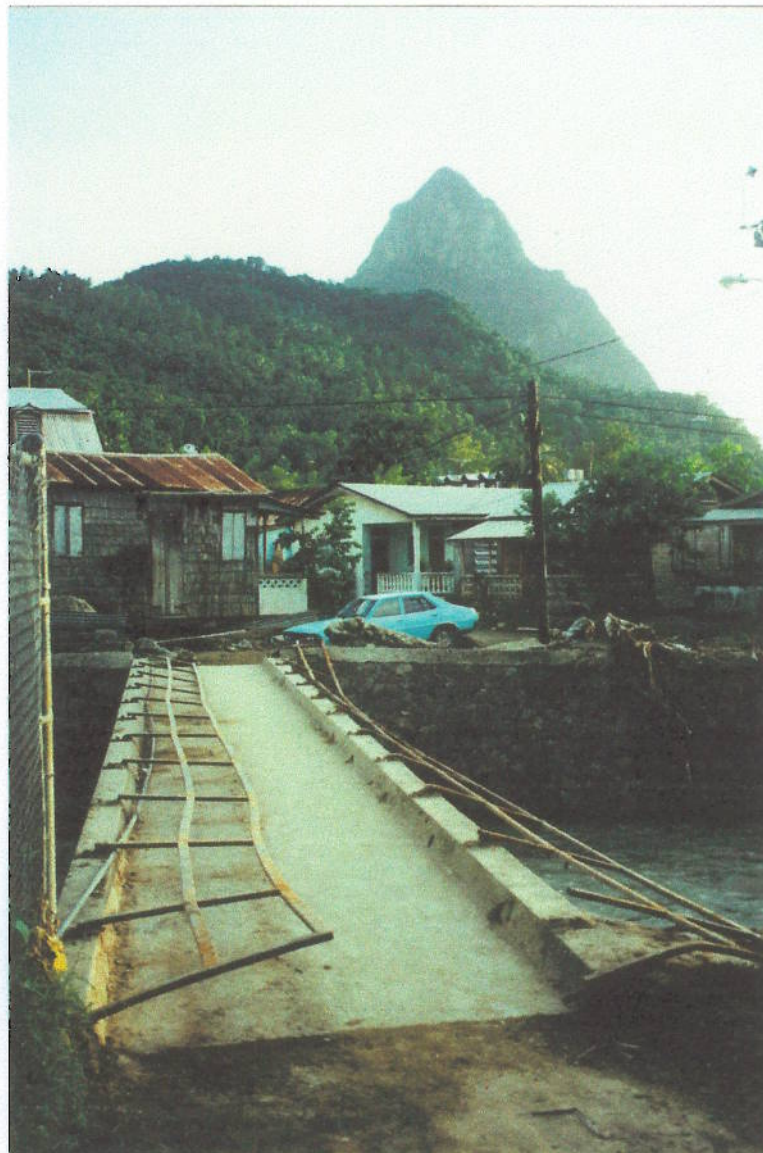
Soufriere Footbridge: Handrails broken due to the pressure of floodwater.
